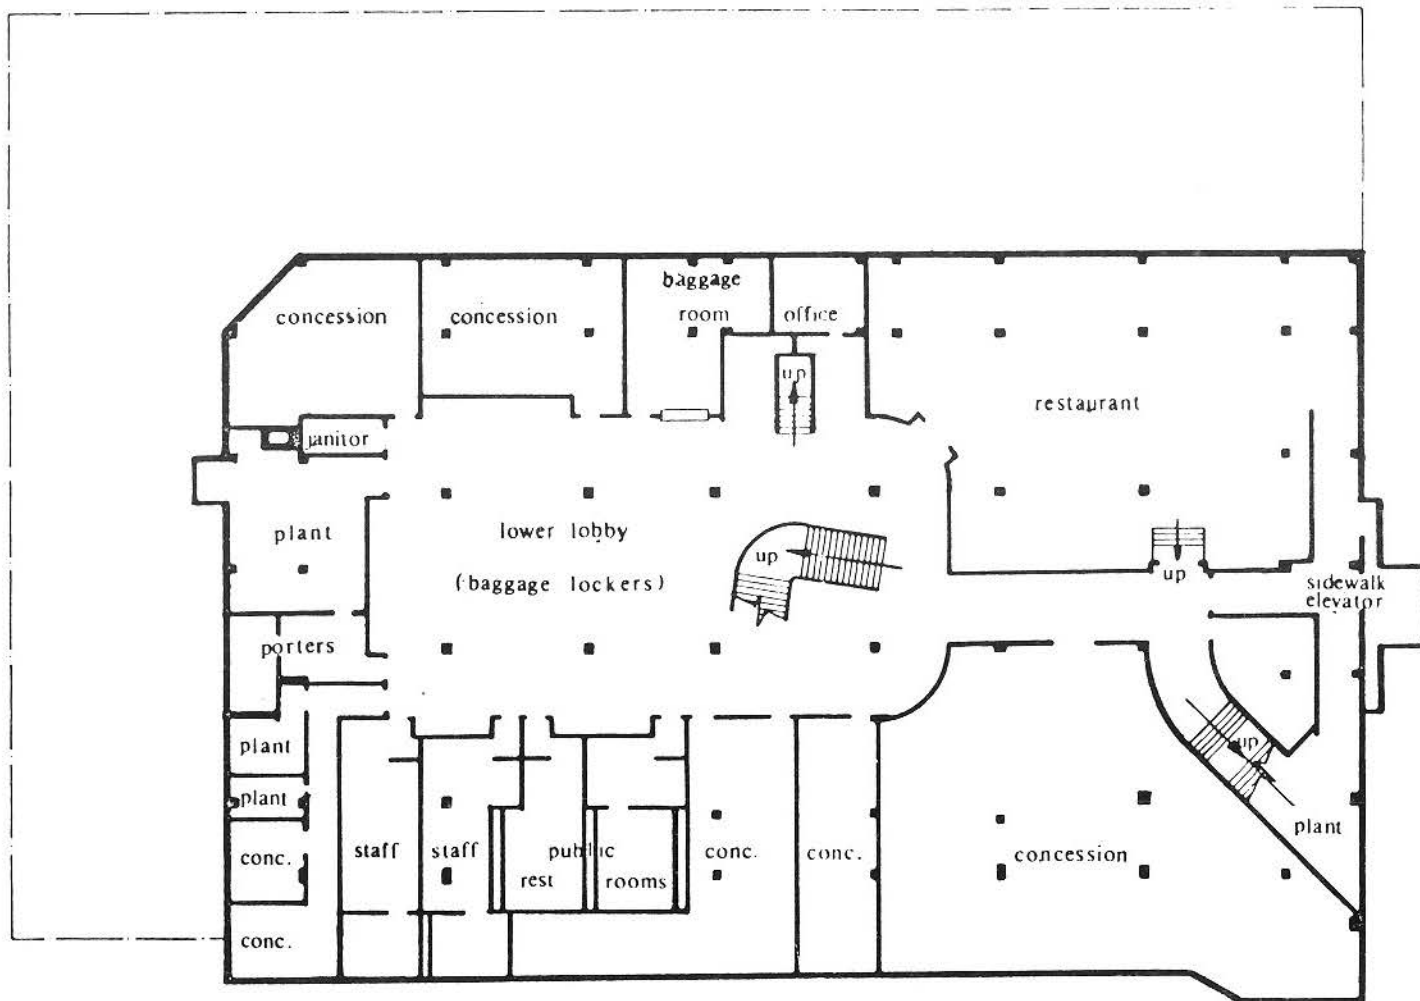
LOWER LEVEL FLOOR PLAN OF THE SAN FRANCISCO DOWNTOWN TERMINAL
